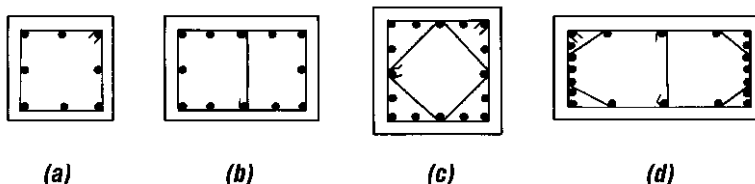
Column ties provide lateral support at corners and to alternate reinforcing bars at a horizontal section. (a) Square column with single tie. (b) Rectangular column with a pair of ties. (c) Square column with a pair of ties. (d) Rectangular column with inclined ties.
